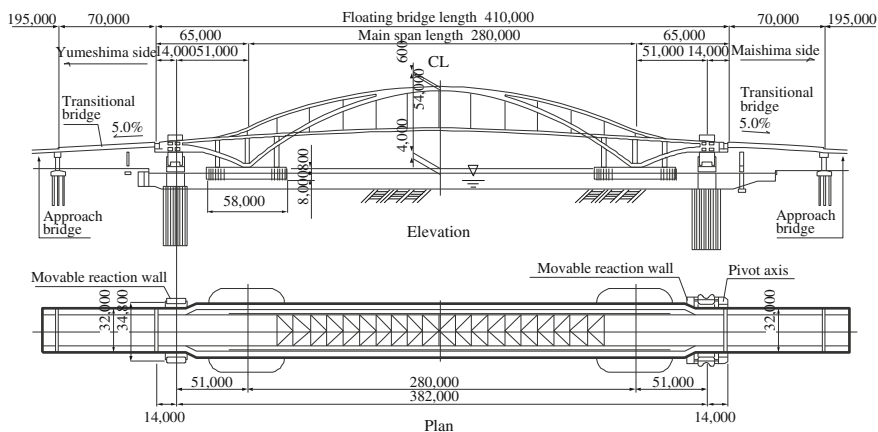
Plan and elevation of Yumemai Bridge, a floating swing arch bridge
